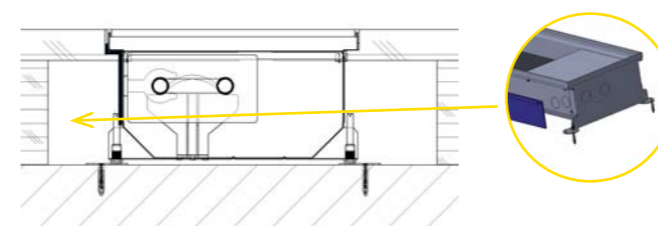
Hollow floor - thermal insulation for floor convector without fan to protect the floor on the exchanger side.
